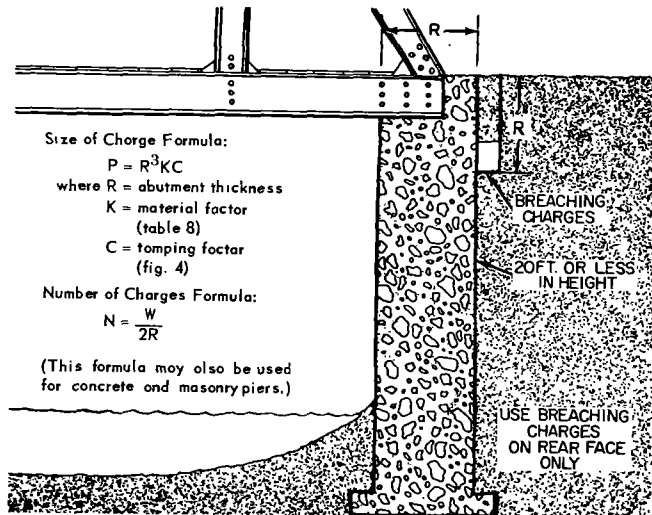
Charges placed in the fill behind a reinforced concrete abutment less than 5 feet thick.
